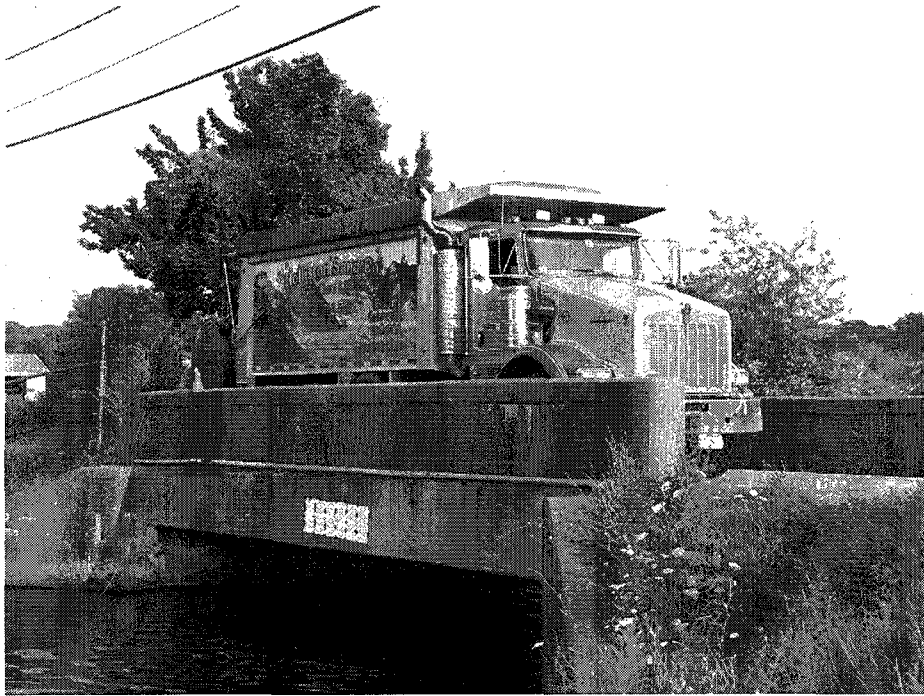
Test truck passing over the Pond Bridge Road Bridge
